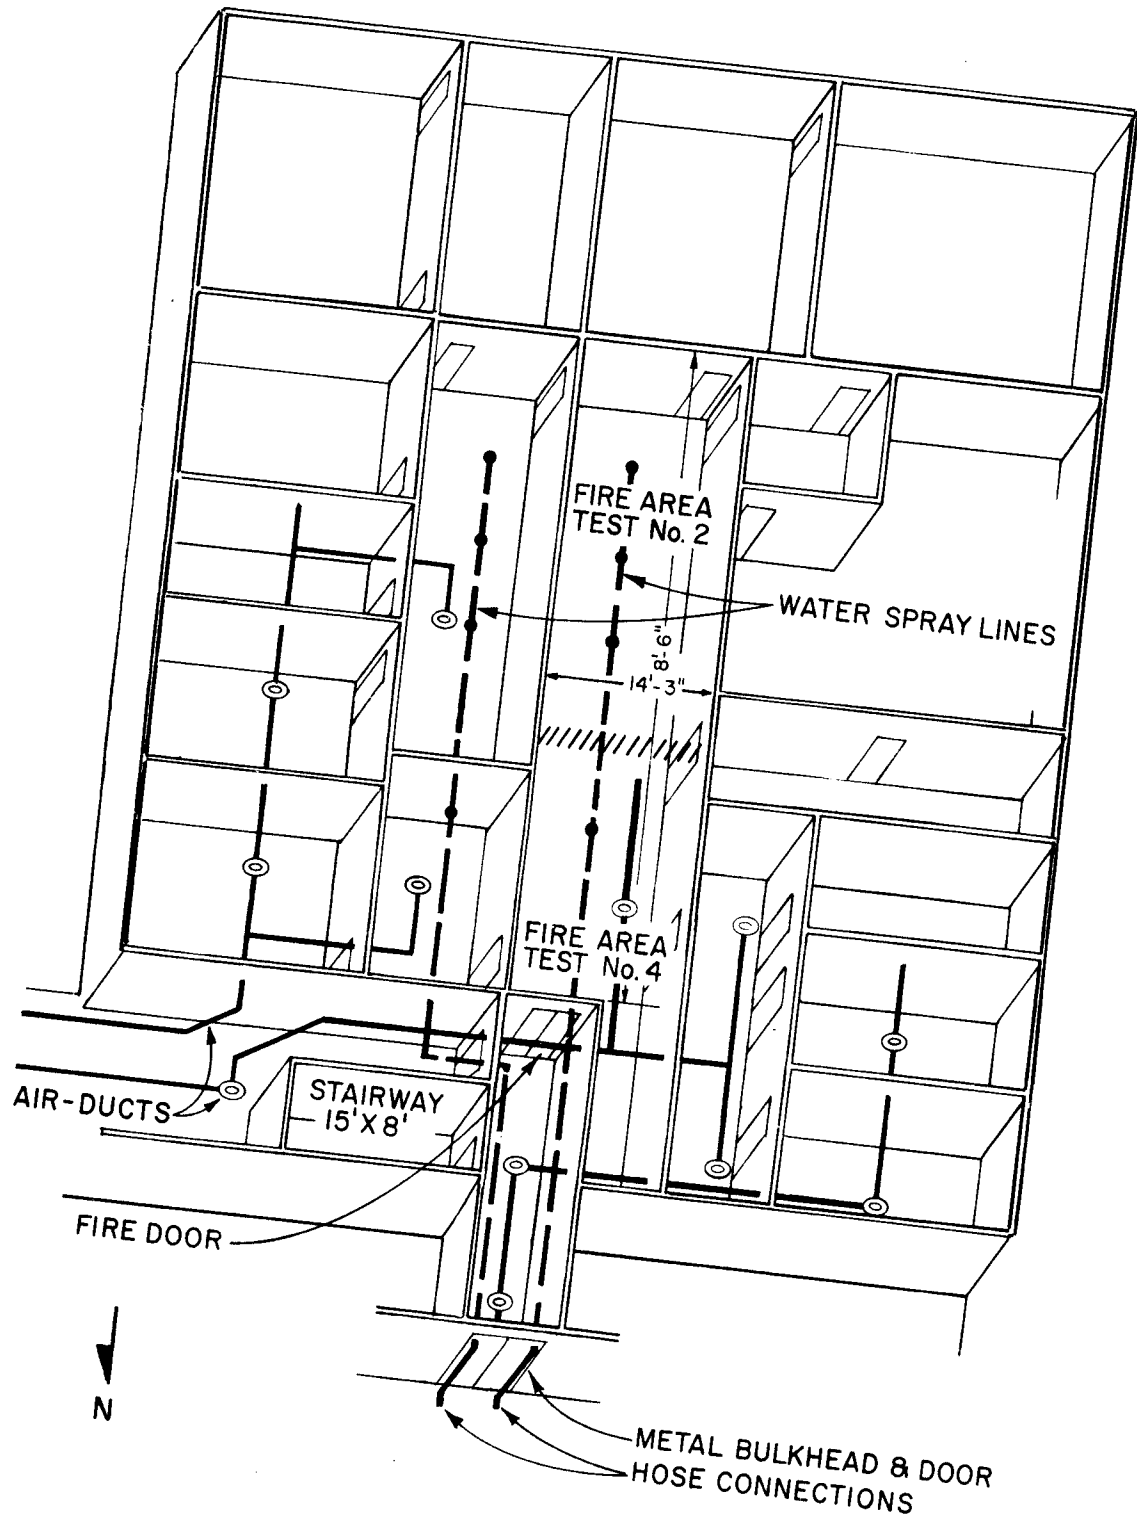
LAYOUT OF 10th FLOOR, FIRE TEST # 2, 4
